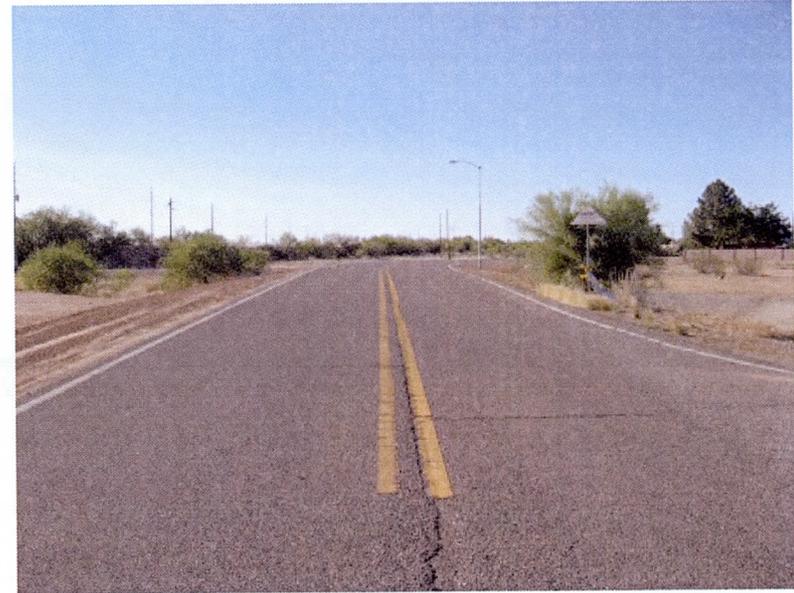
Looking SE at Citrus Road at intersection of Citrus Road and Old Happy Valley Road.
